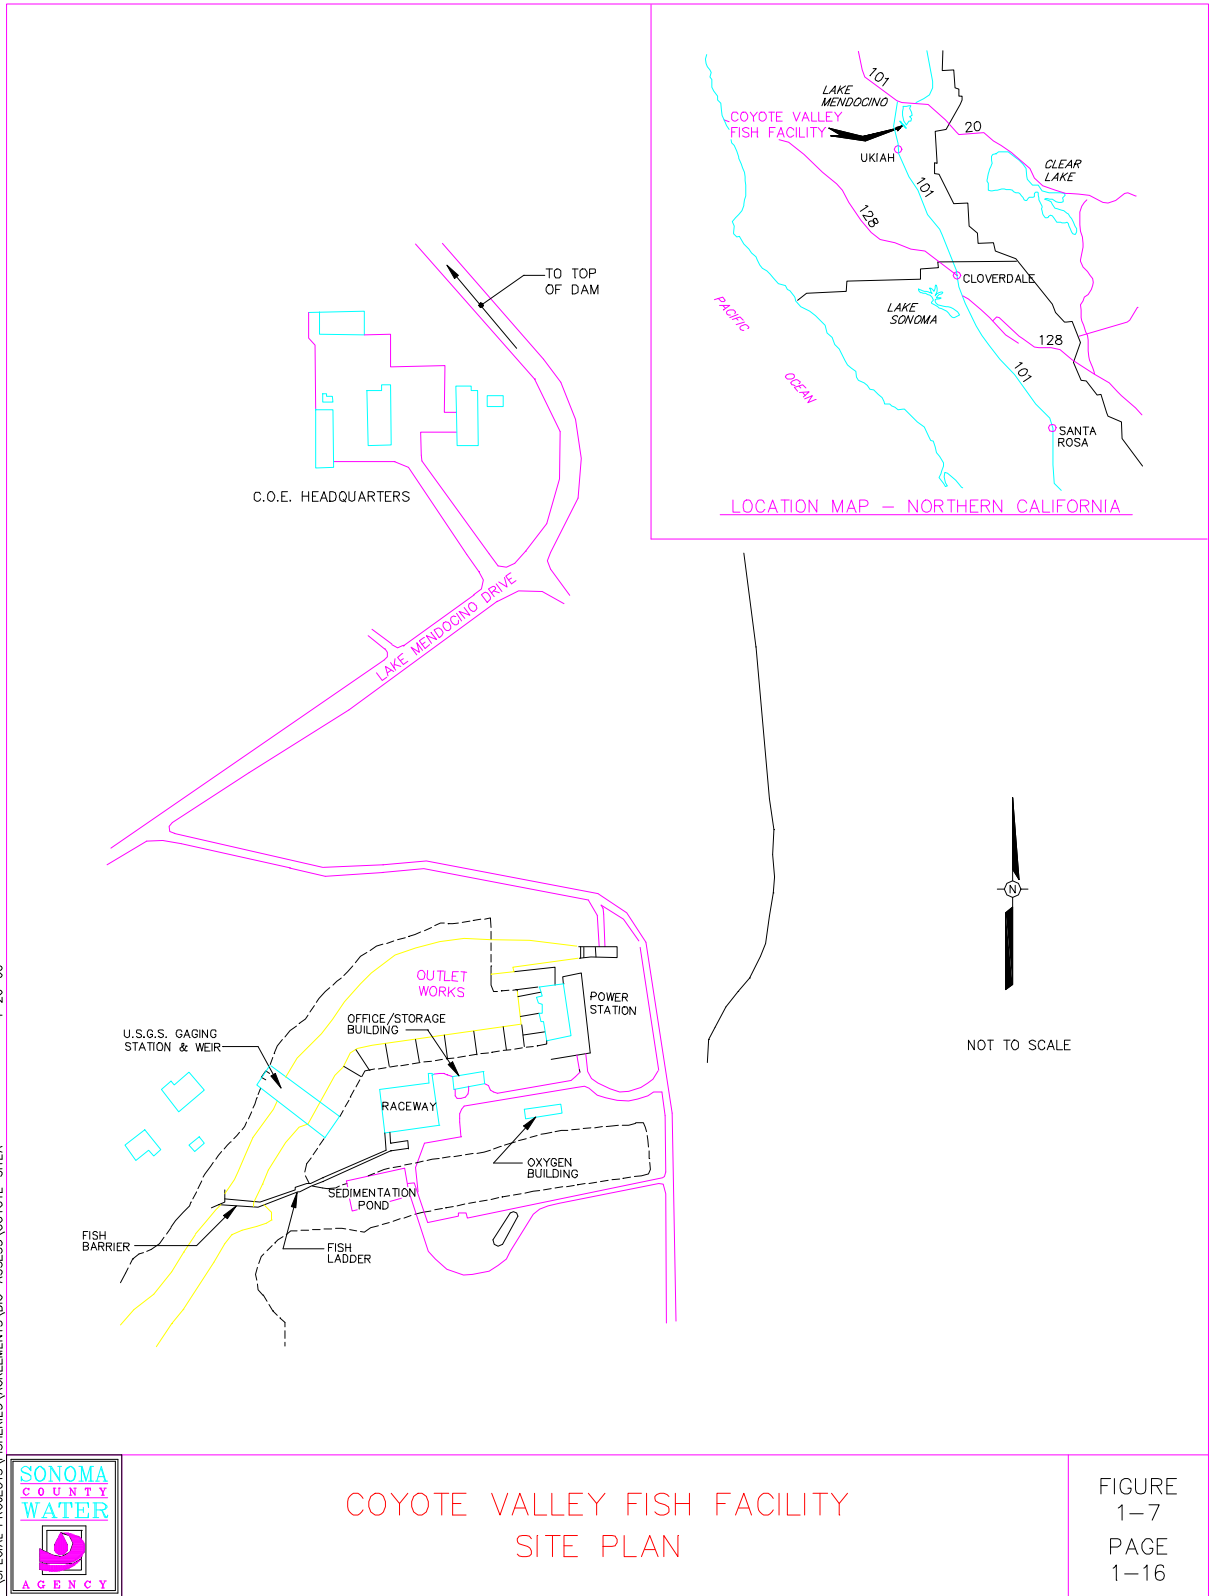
Coyote Valley Fish Facility Site Plan.
